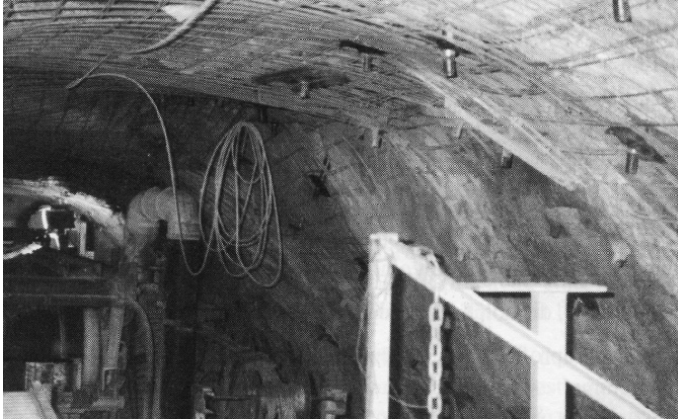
Tunnel wall of the Amsteg pressure tunnel with spalling described as rock burst.
